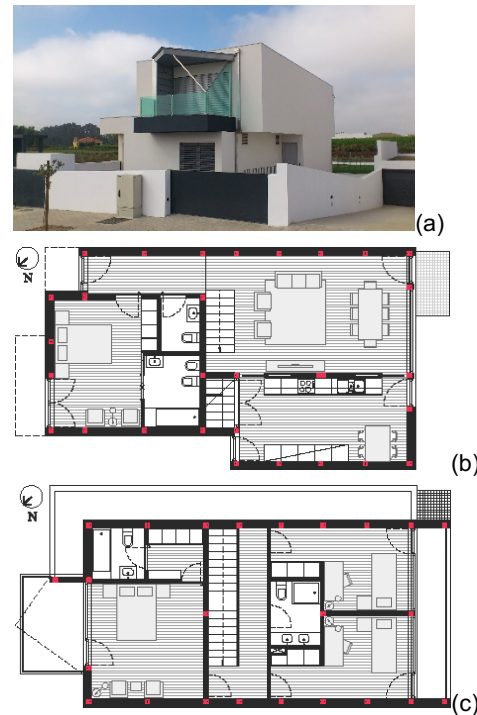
Architectural blueprints: (a) 3D view; (b) ground floor (c) elevated floor.
